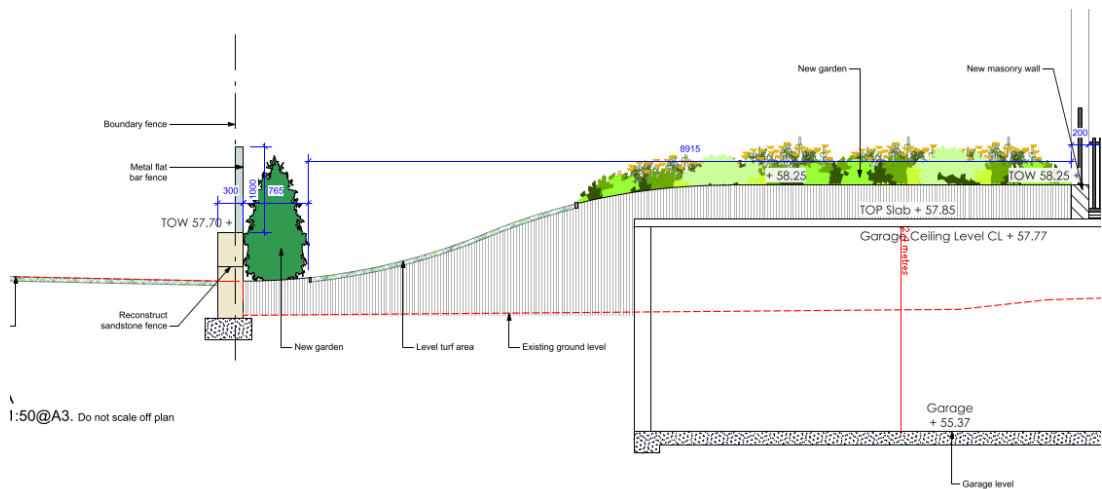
Proposed Front Yard and Basement Garage Section (Source: Applicant)
